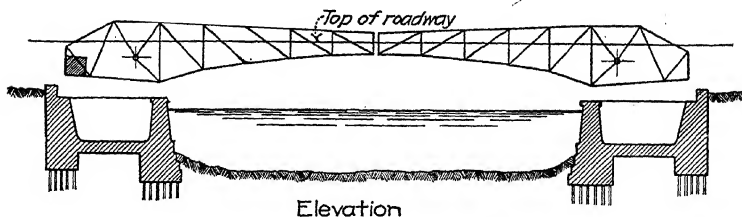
Erie Street Bridge, Chicago, built 1910.
